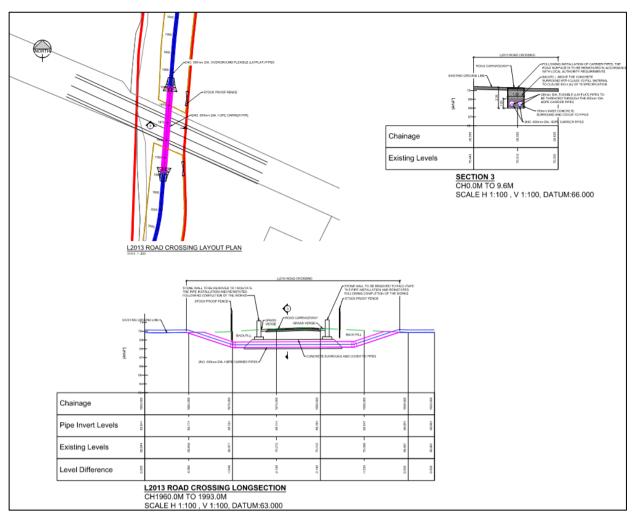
Proposed L2013 road crossing detail. Source Dwg. 24821-MWP-00-00-DR-C-0402 (MWP) | not to scale
